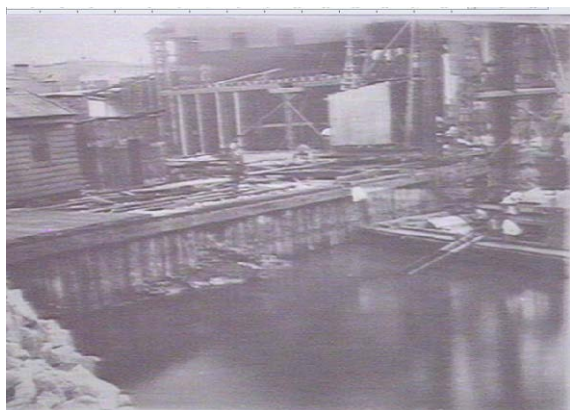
Timber sheet piling between Wharves 35 and 36, Darling Harbour, 1919.⁴⁴
